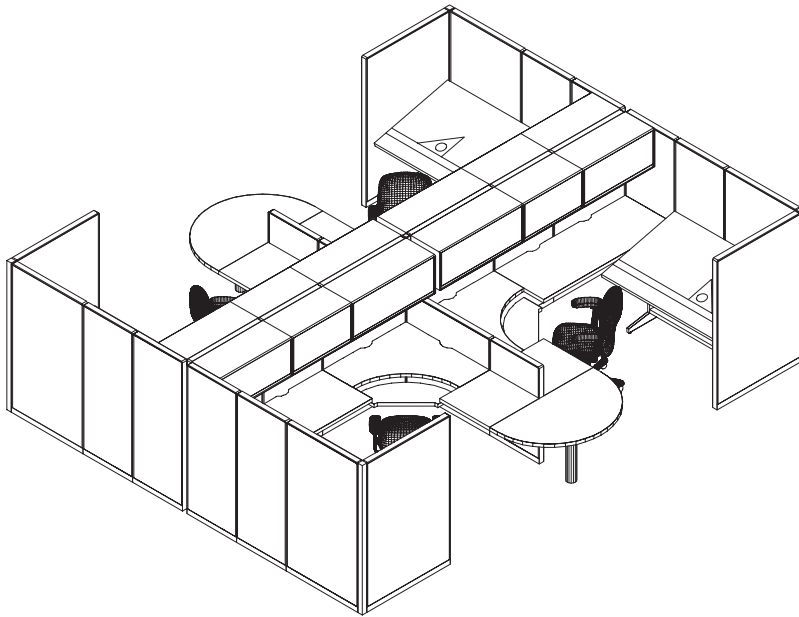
Design drawings can be done in a variety of techniques, such as this isometric drawing.
